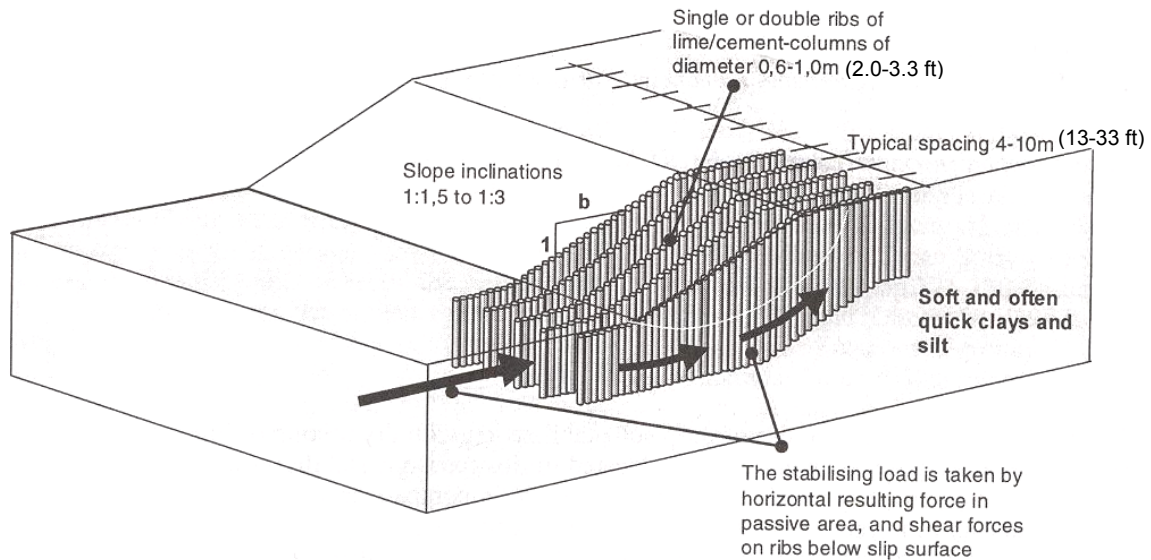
Slope stabilization with lime-cement columns (Watn et al. 1999)
